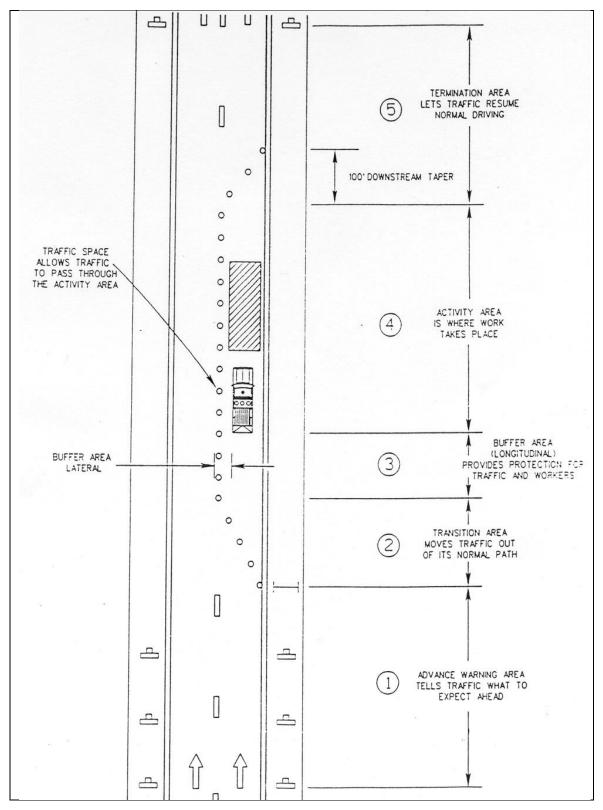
Typical Work Zone Sections (Source: Garber and Zhao, 2002)
